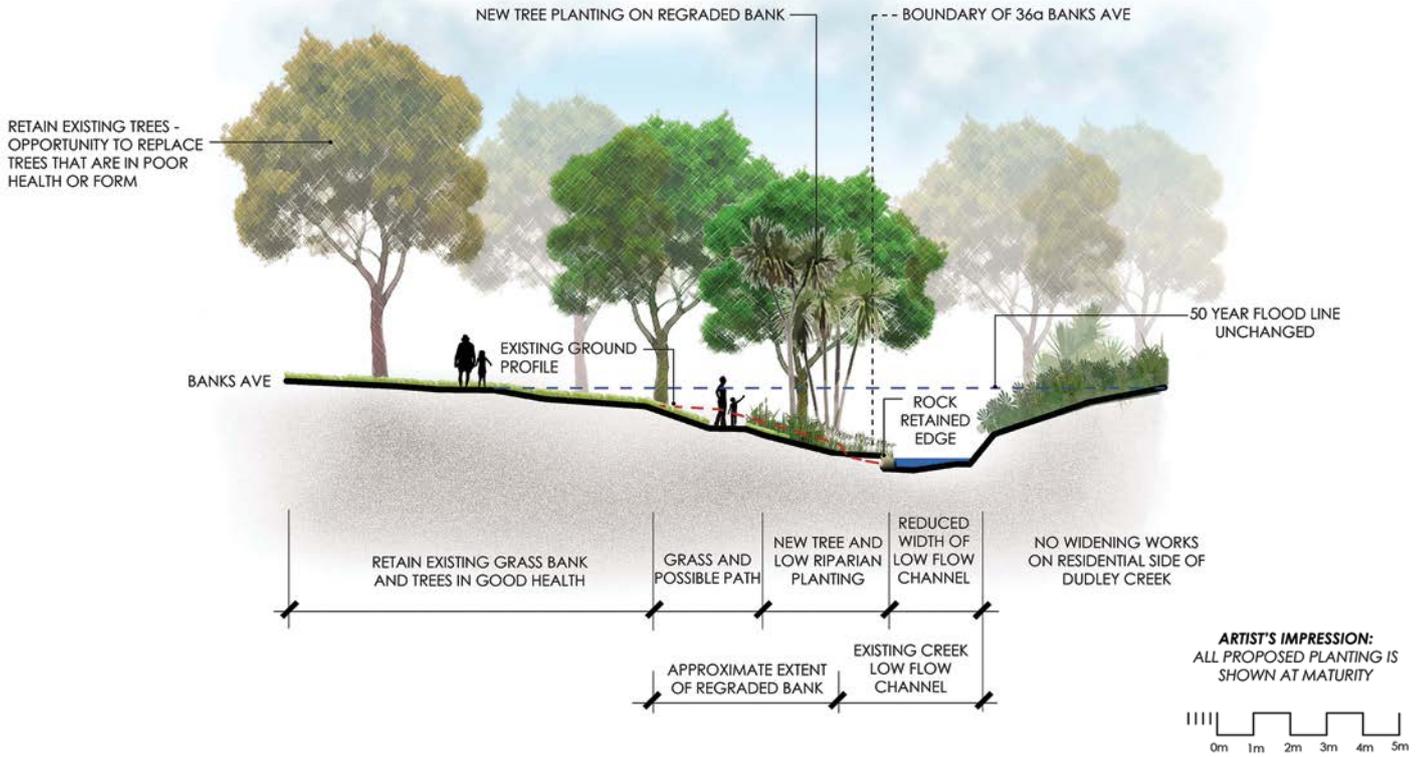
Downstream Option A – Cross Section E (looking downstream from 80 Banks Avenue)
